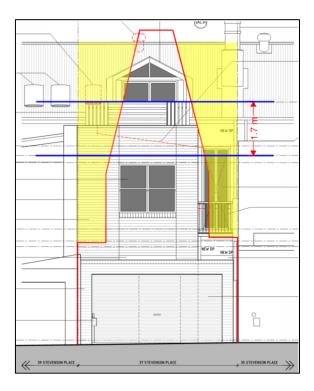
the NDCP 2012 - building envelope variation from side boundaries (shaded yellow); the blue line indicates the proposed floor level of the roof terrace and the top of the privacy screen, ensuring views at a 1.5m eye level when standing on the terrace are suitably screened.
